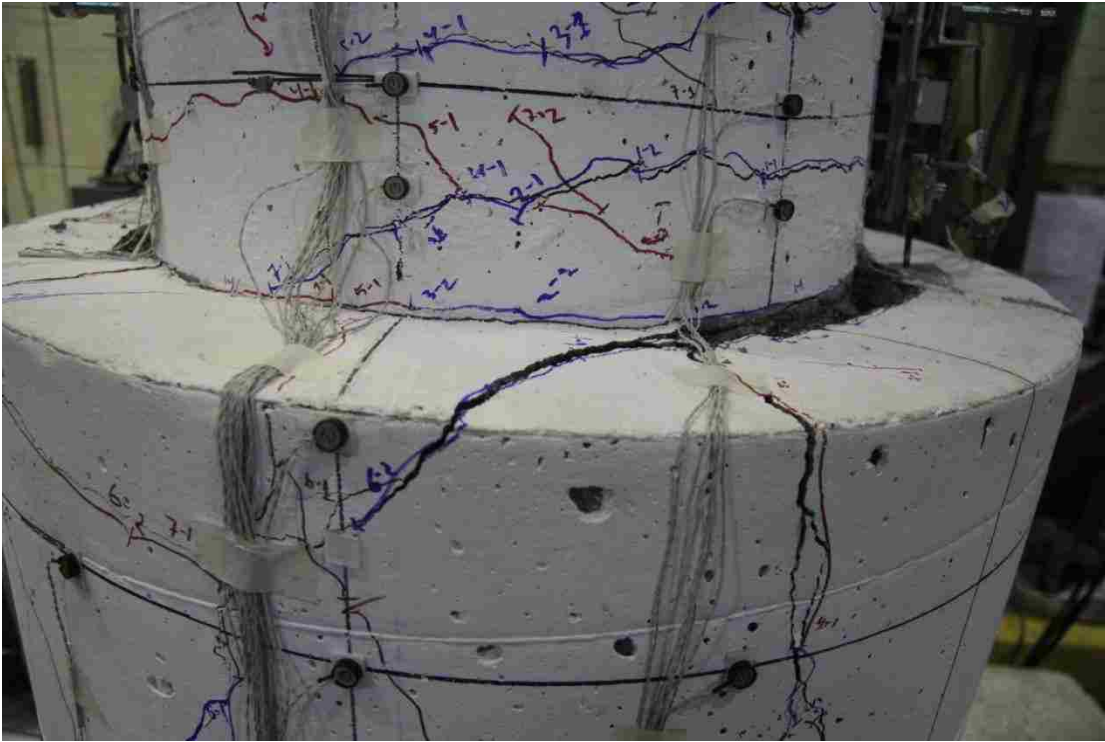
DS-2 – Shaft damage when first shaft spiral fractured at 4.59/-4.59 percent drift
